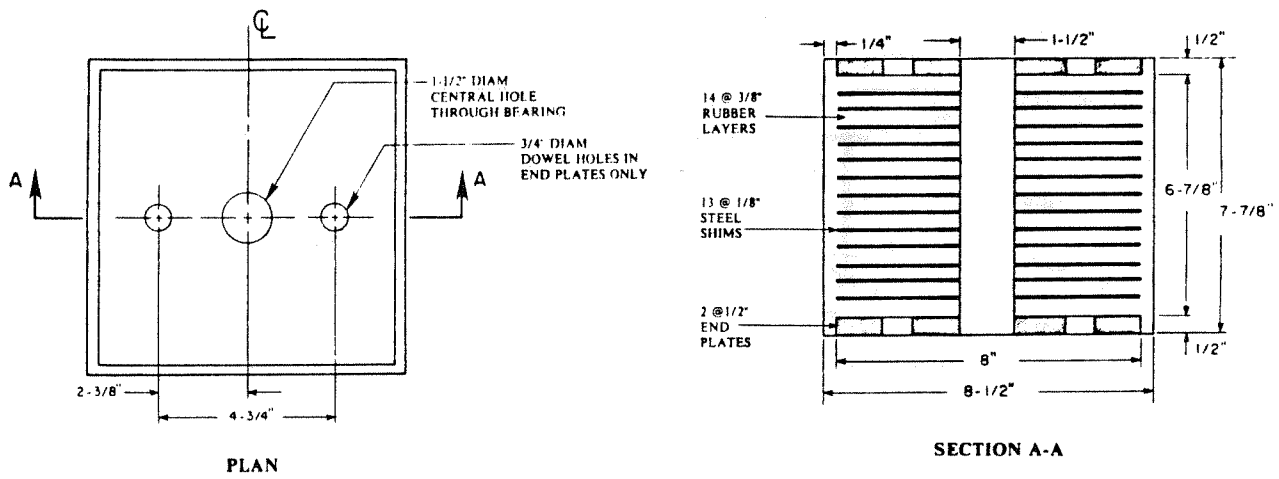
Cross-section and plan view of natural rubber isolation bearings
